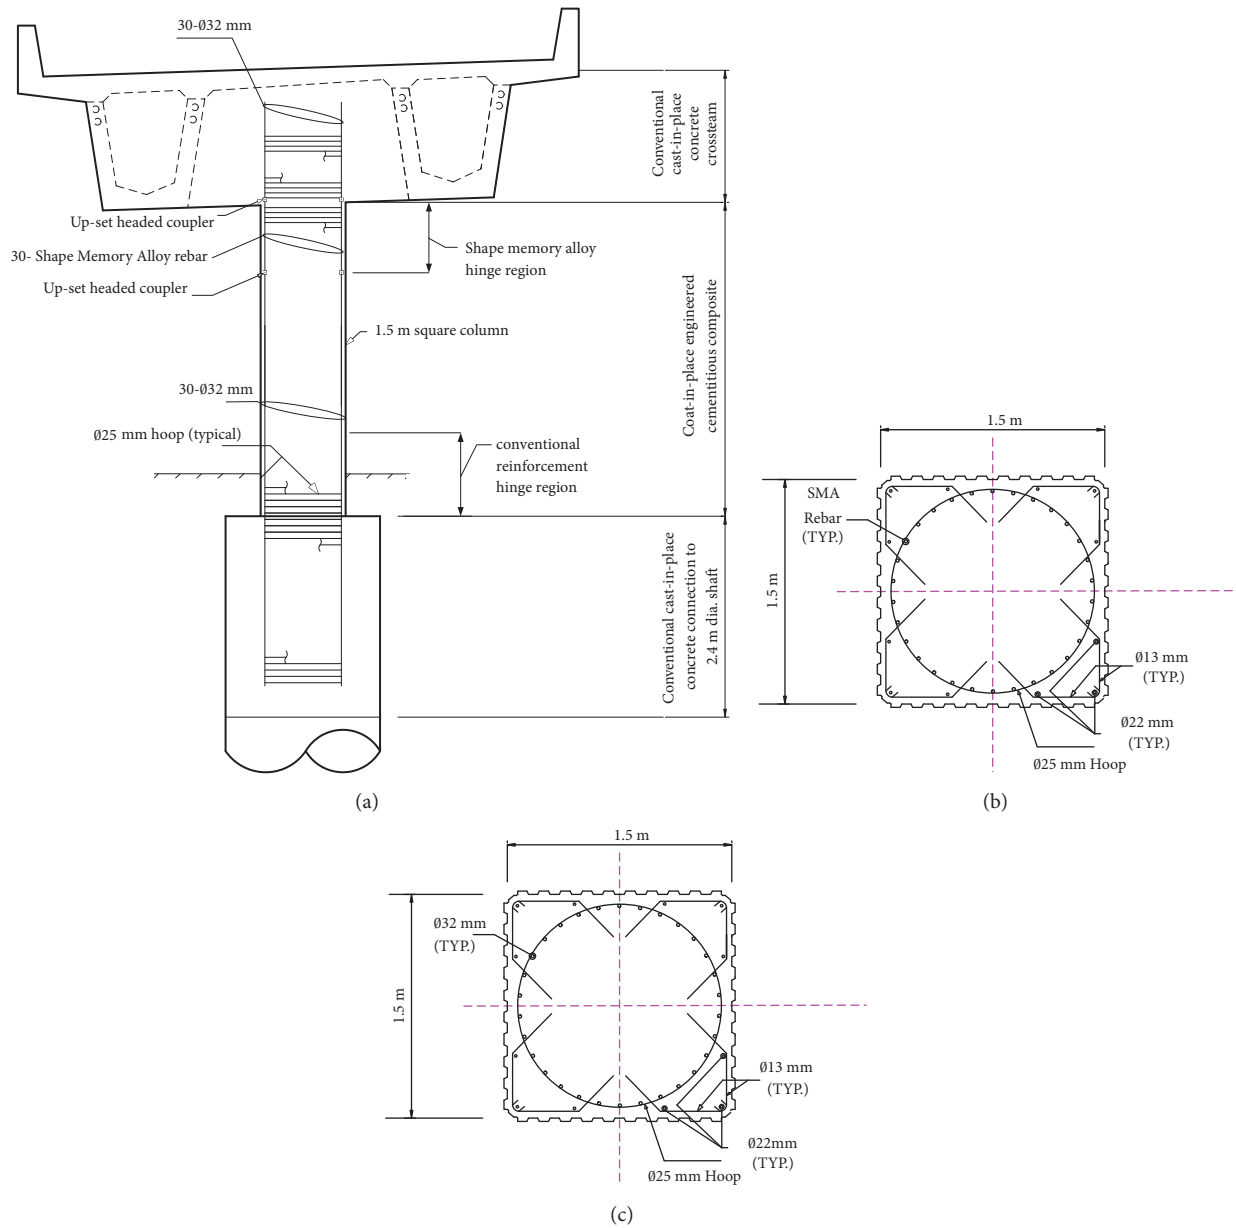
SR99 pier elevation column cross section details: (a) pier elevation, (b) SMA section, and (c) mild steel section.
